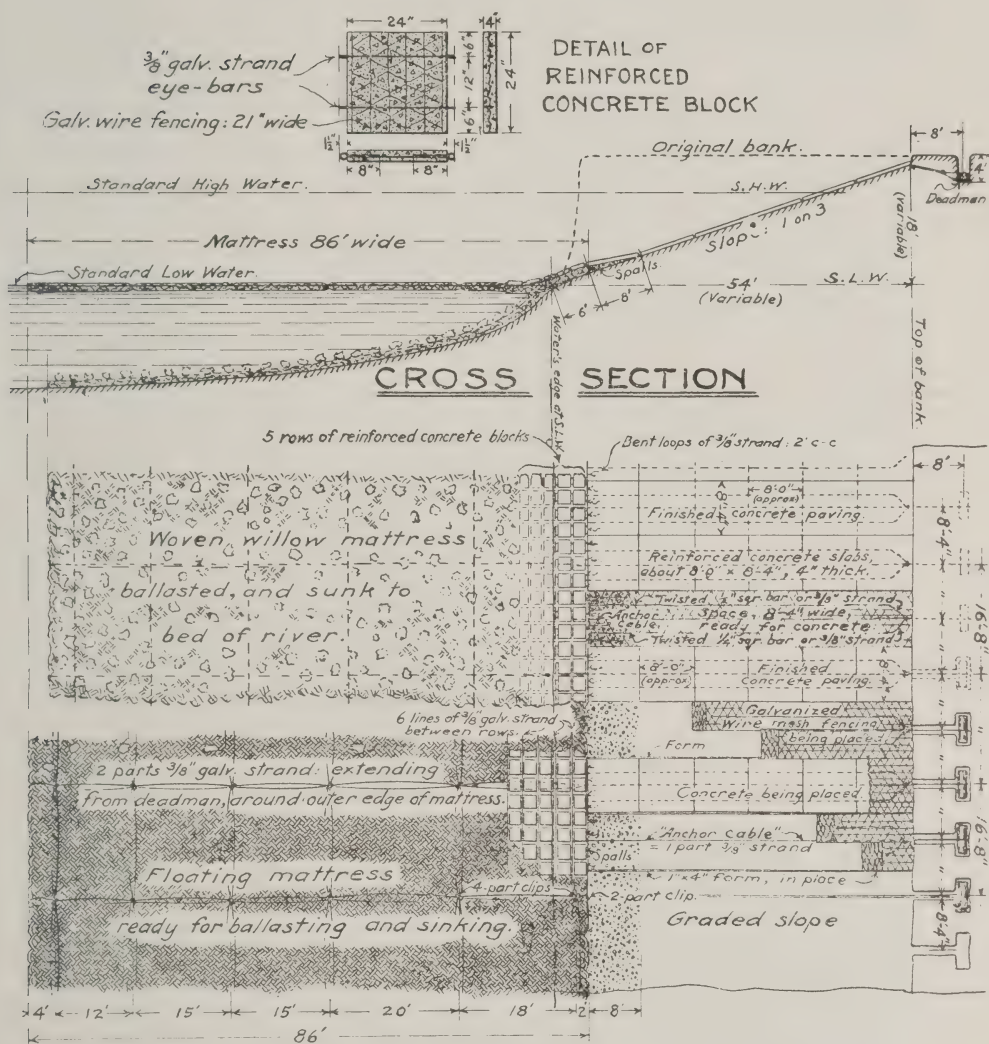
Plate II. General Plan, Combination Concrete and Willow Mattress Revetment. (Missouri River Improvement. U. S. Engineer Office, Kansas City, Mo., 1916.)
